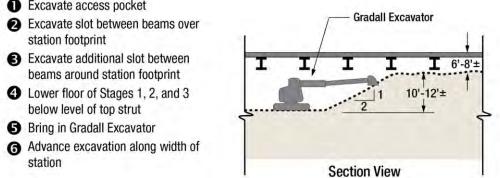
Plan Showing Excavation Procedure of Shallow Lifts with Low-Profile Gradall Excavator
